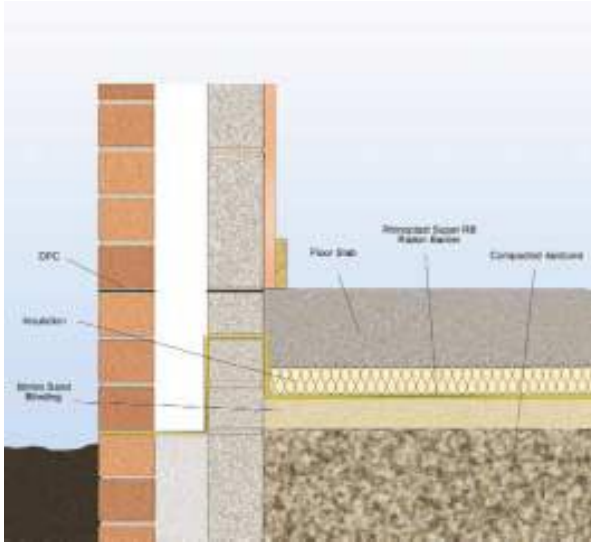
Detail showing radon barrier placed on soft sand blinding under insulation and floor slab
